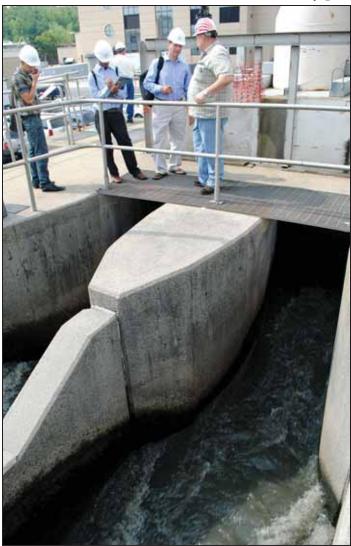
Example of a concrete secondary treatment channel where a hydrokinetic system can be installed.
